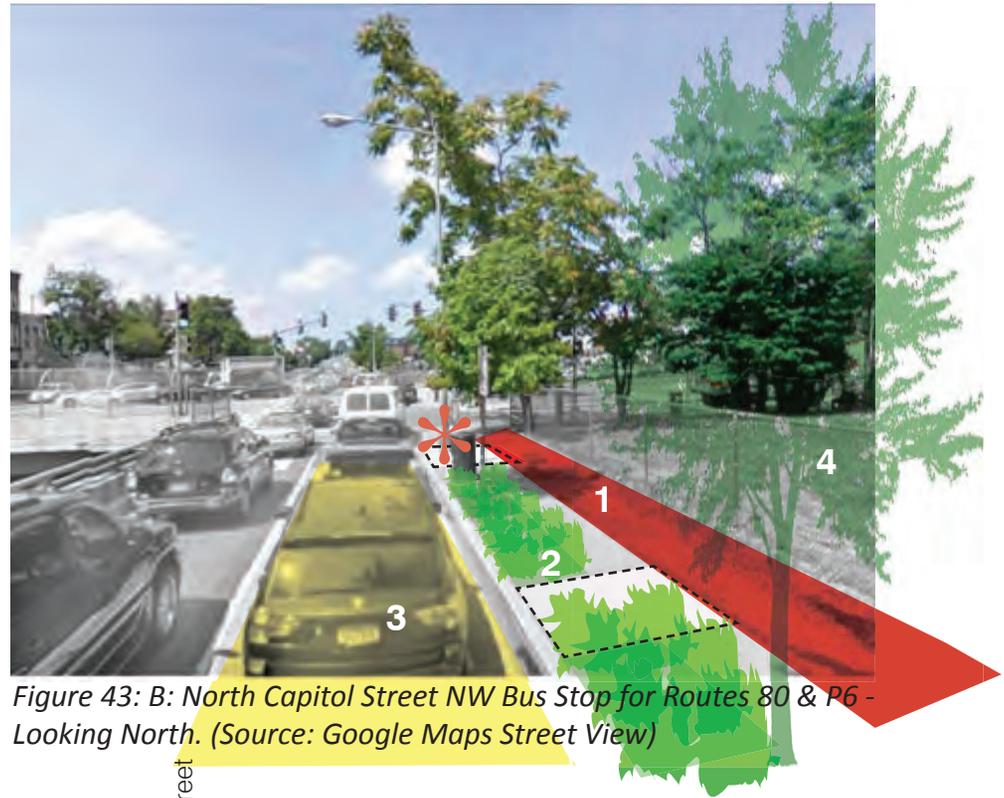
B: North Capitol Street NW Bus Stop for Routes 80 & P6 - Looking North. (Source: Google Maps Street View)
